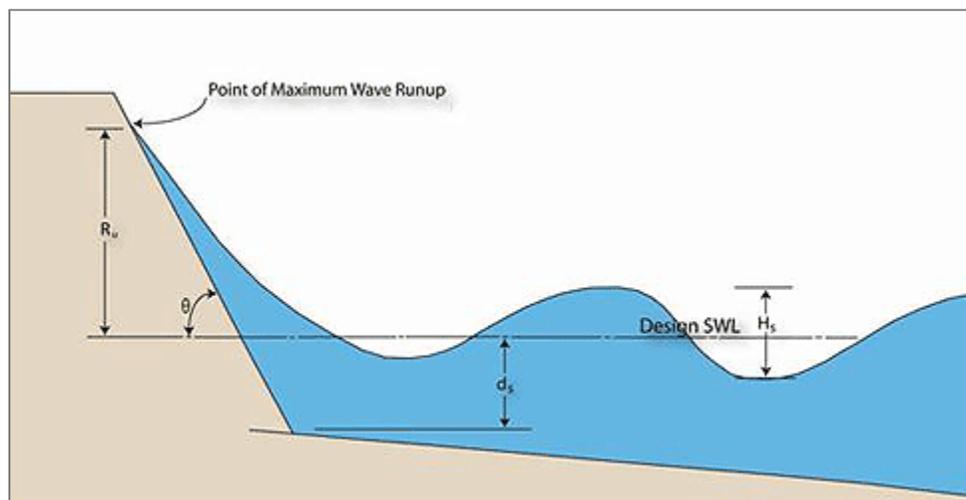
Wave Run-up Sketch (Source: FHWA, 2008)
